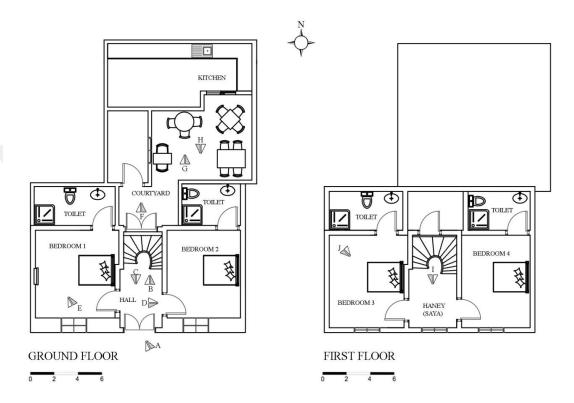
"Villa Teos Guest House" Melahat Yorulmaz, ground and first floor plans (S.Sevimbige archive, 2017)
